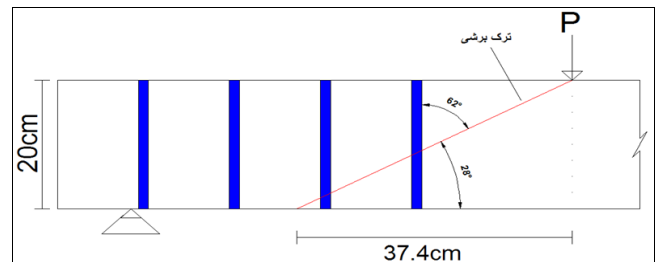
Schematic view of the angle between shear crack and GFRP rebar in NSMV10 beam
